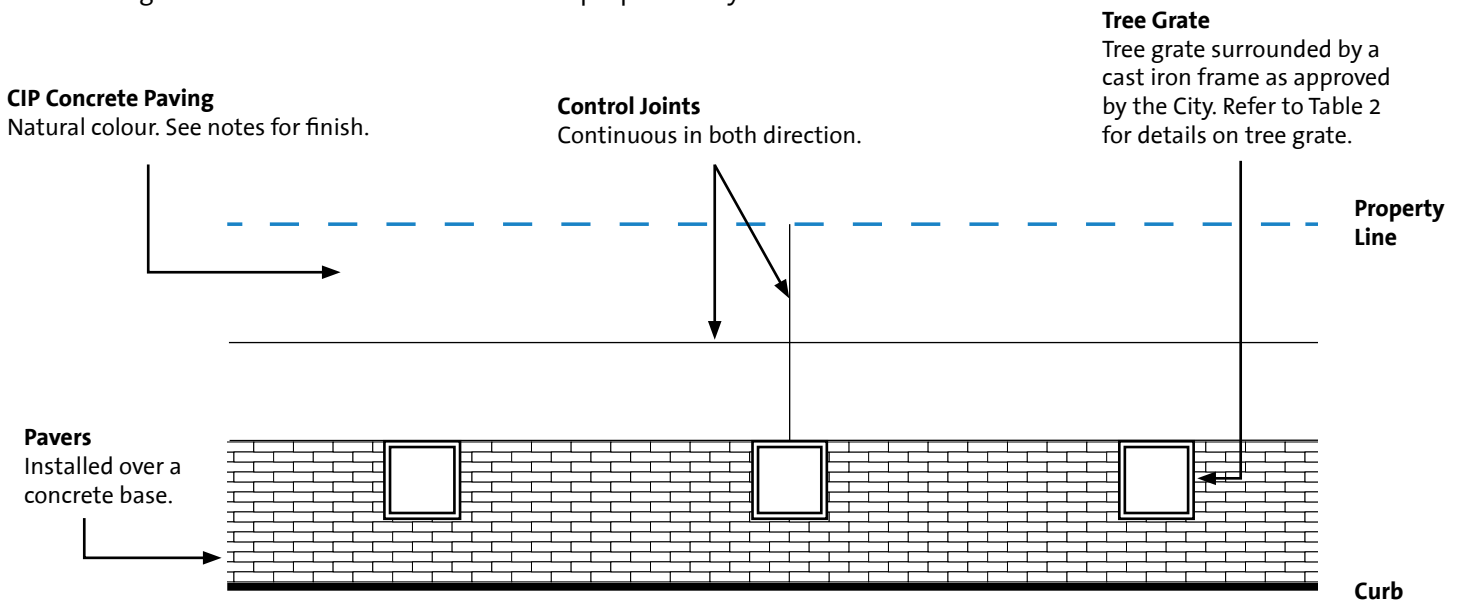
Pavers along Mandatory Commercial Street Frontage Types, Secondary Active Street Frontage Types With Commercial Frontages and “Downtown Promenade” Character Street.
